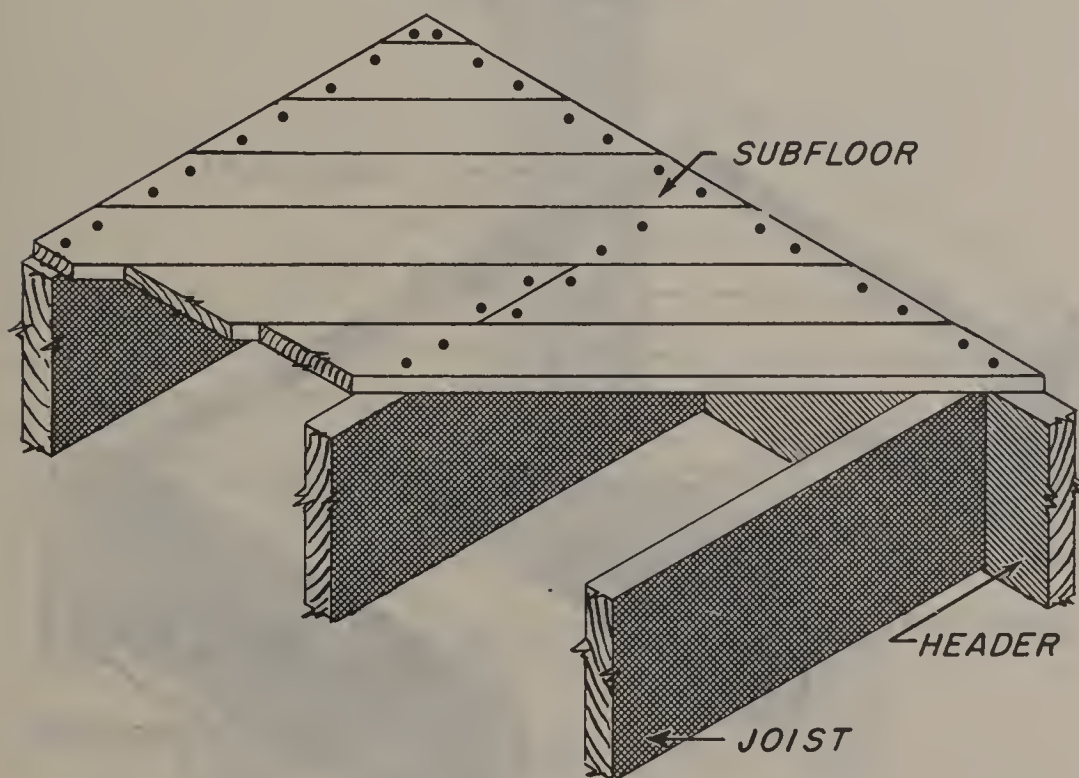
Subfloor (or attic floor). Boards 6 inches or less in width nailed with two eightpenny nails, and wider boards with three eightpenny nails at each crossing of framing member. Note: If subflooring is tongued and grooved on ends and edges, end joints need not be made over joists. Subflooring is preferably laid without cracks between boards. When, however, accumulation of water on the subfloor during construction is likely, it may be desirable to leave sufficient cracks to permit drainage and avoid swelling of the subfloor with resultant warping and cupping.
